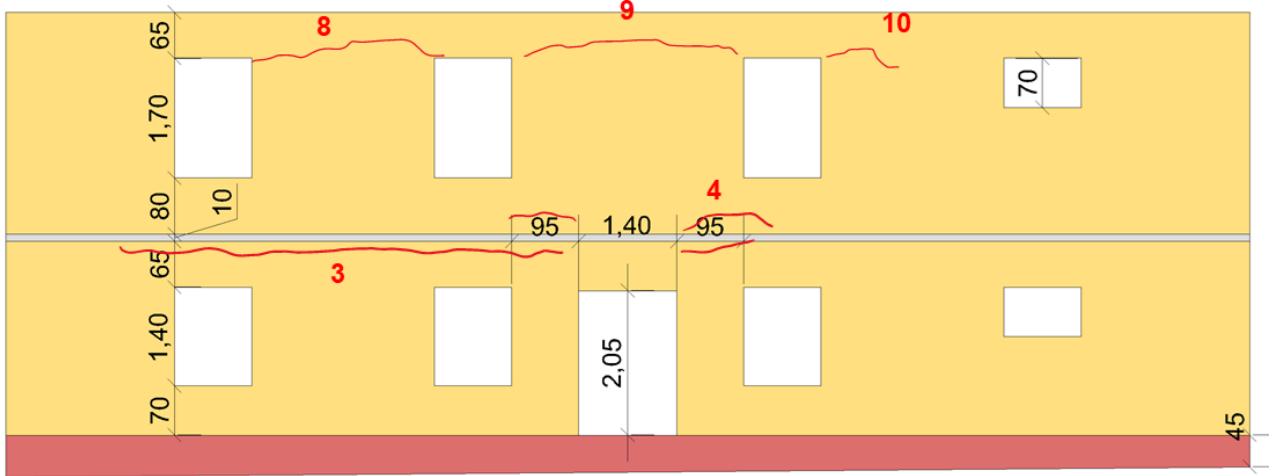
OOP mechanism west facade: Relevant cracks that indicate the mechanism, west facade
